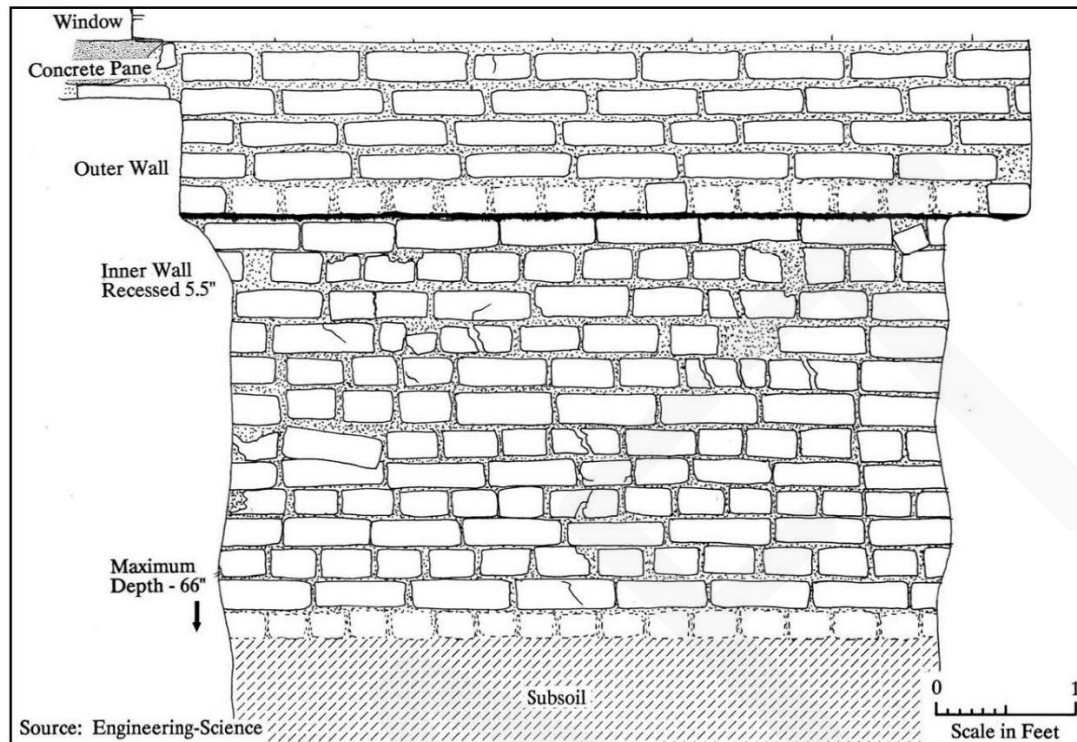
South Profile, North Wall, Construction Pit No. 2 (Walker et al 1992:74)
